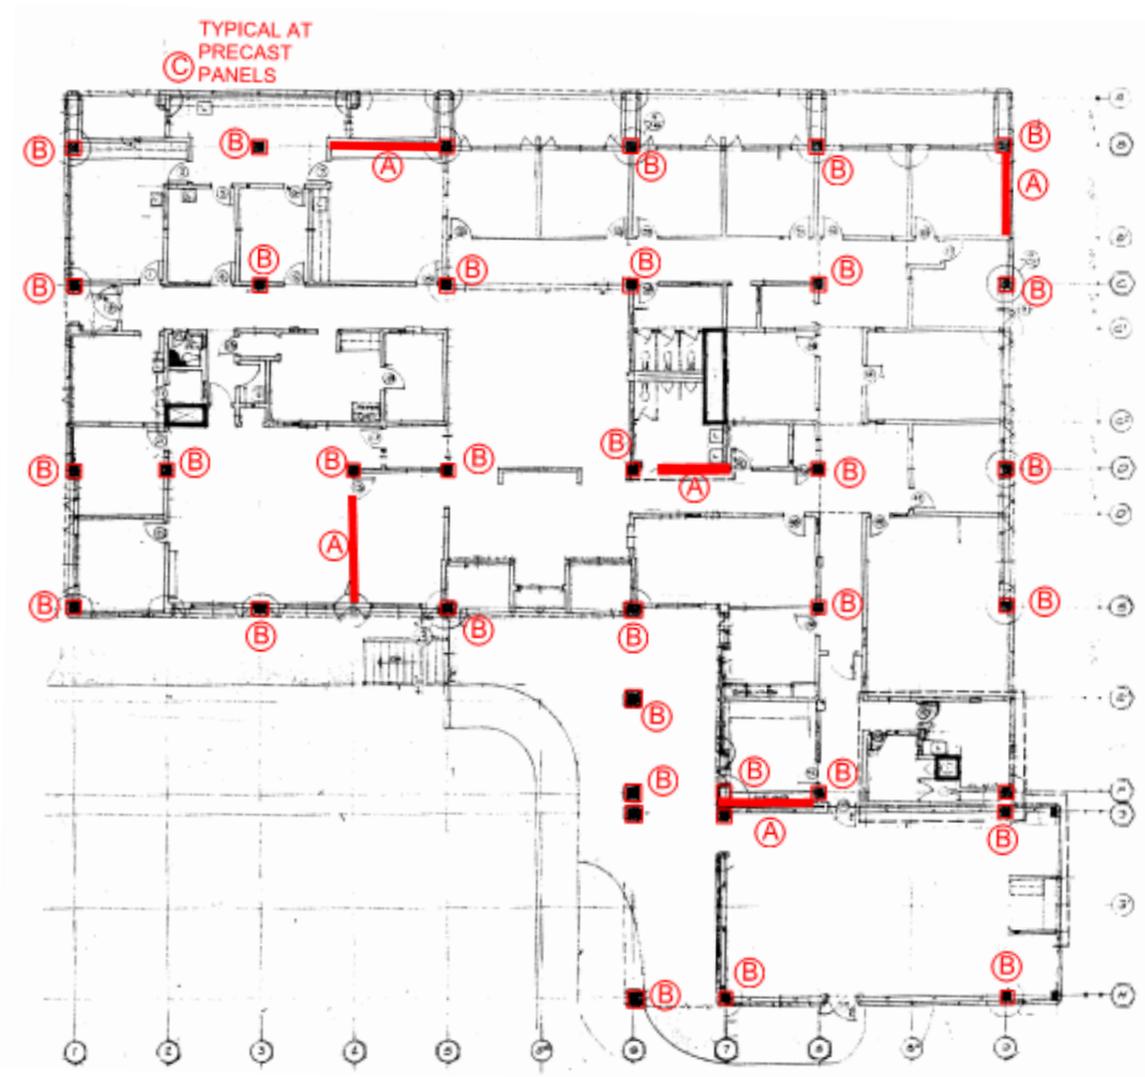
Typical floor plan at Annex indicating: A=proposed locations of retrofitted shear walls; B=concrete columns; C= exterior precast concrete façade panels
